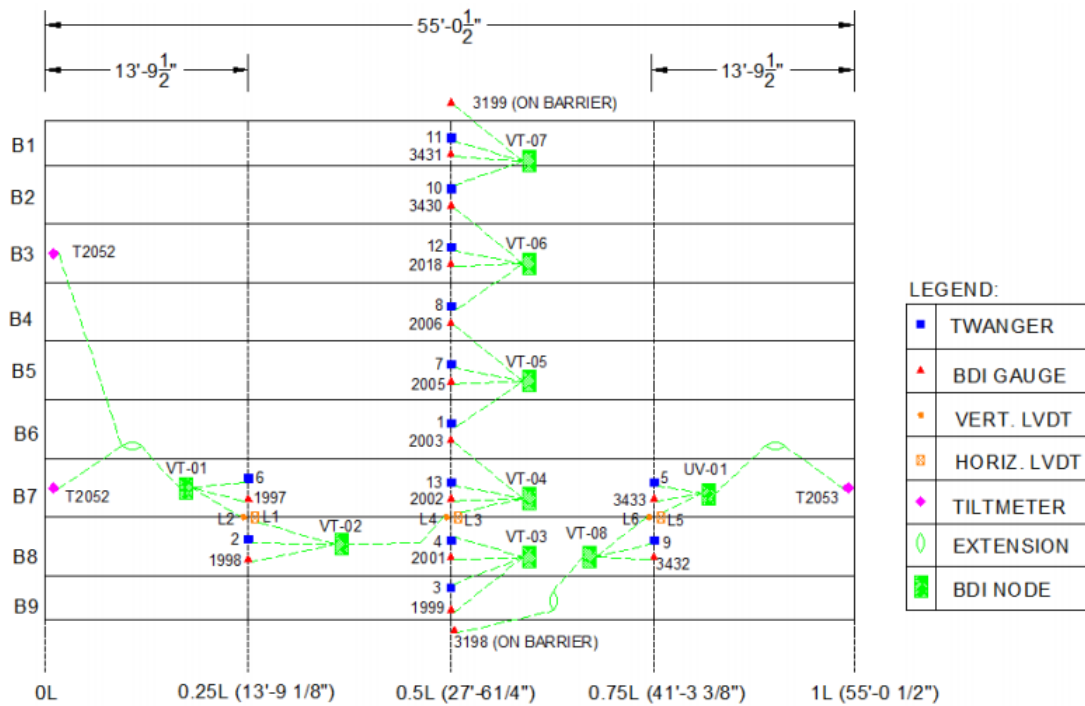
Arden Road Bridge Layout and Instrumentation (Halbe, 2014)
